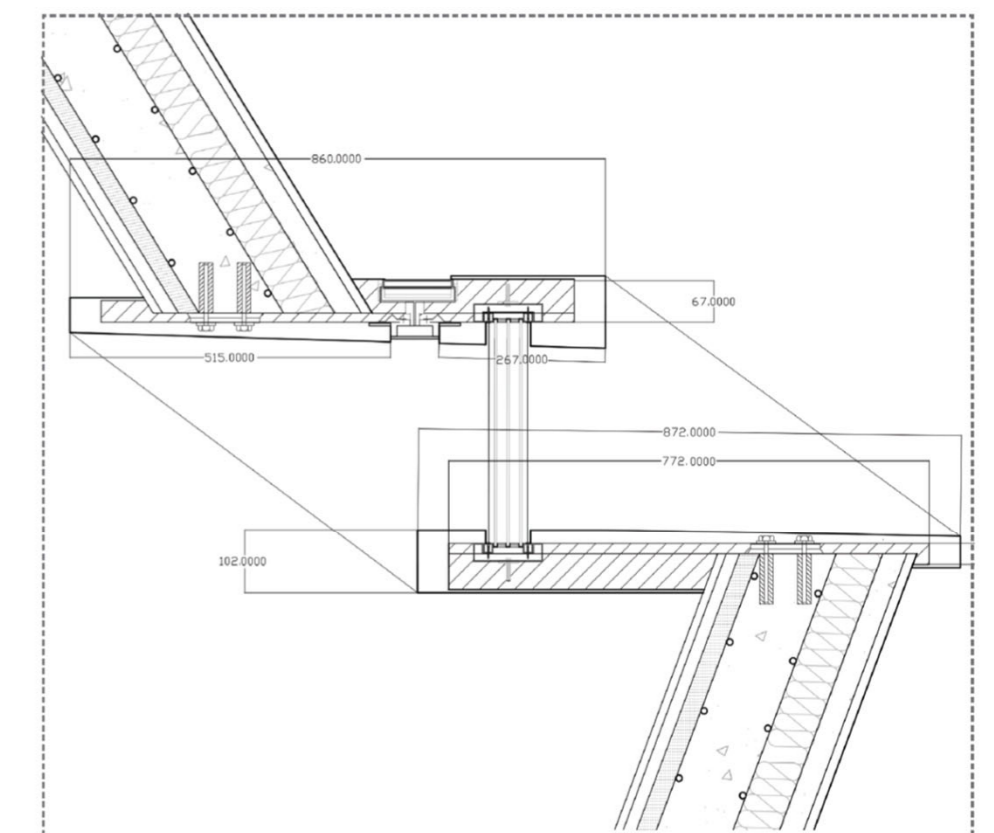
2 showing main structural bolt connecting Wooden Framework of Window Pane to Concrete with industrial wall plug and anchors and nails
